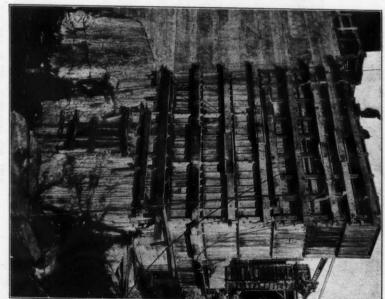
Side Face of South Pier Wall, Showing Completed Concrete, Line-Drilled Rock Face, and Wall, Forms Above, November 6711, 1915.
